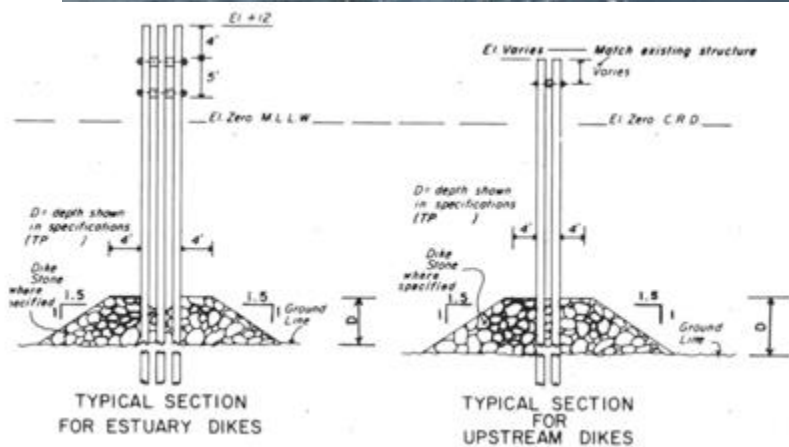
Typical Pile Dike Cross-Sections (USACE, 1988)
